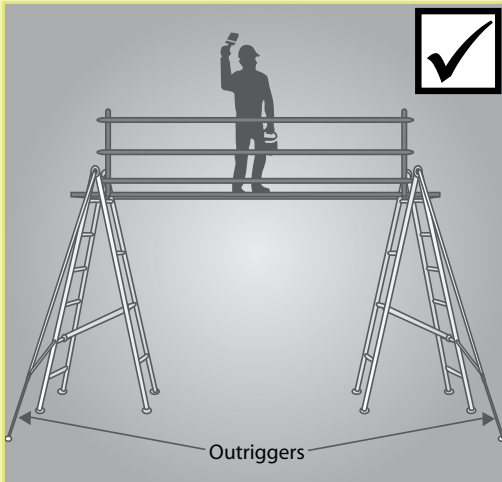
A correctly set-up trestle scaffold showing guardrailing and outriggers (toeboards not shown).
